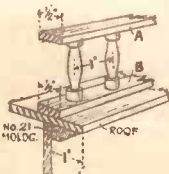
The balcony and roof with the cornice moulding beneath.
